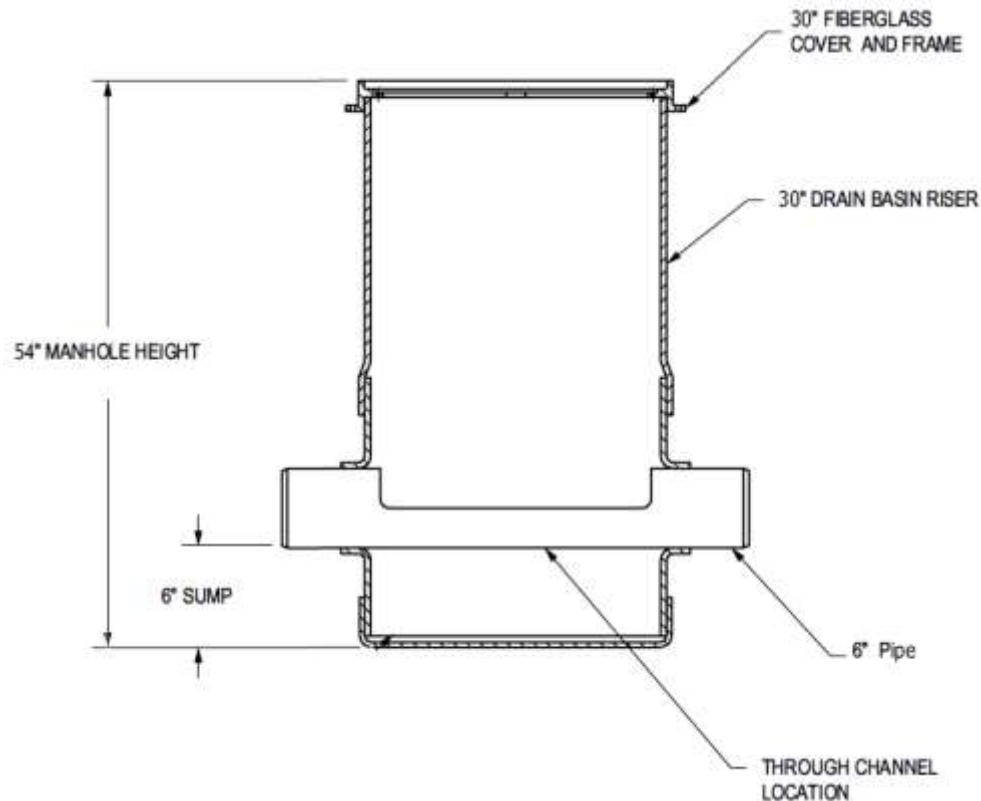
Monitoring manhole cross section. Source: ADS-pipe shop drawings
